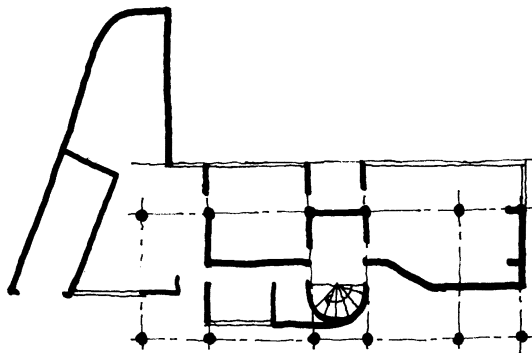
Harding and Tecton, 'Six Pillars', Dulwich, London, 1934. Ground floor.
